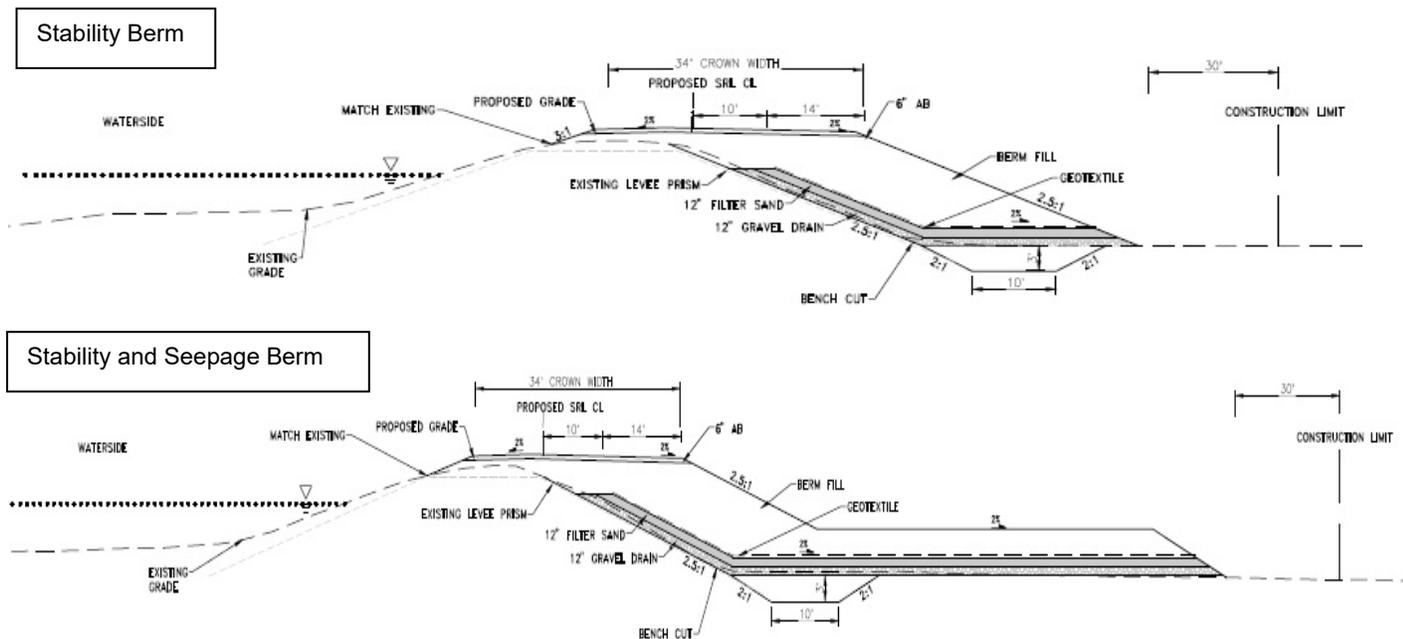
Proposed typical design cross section for a drained stability and seepage berm.
